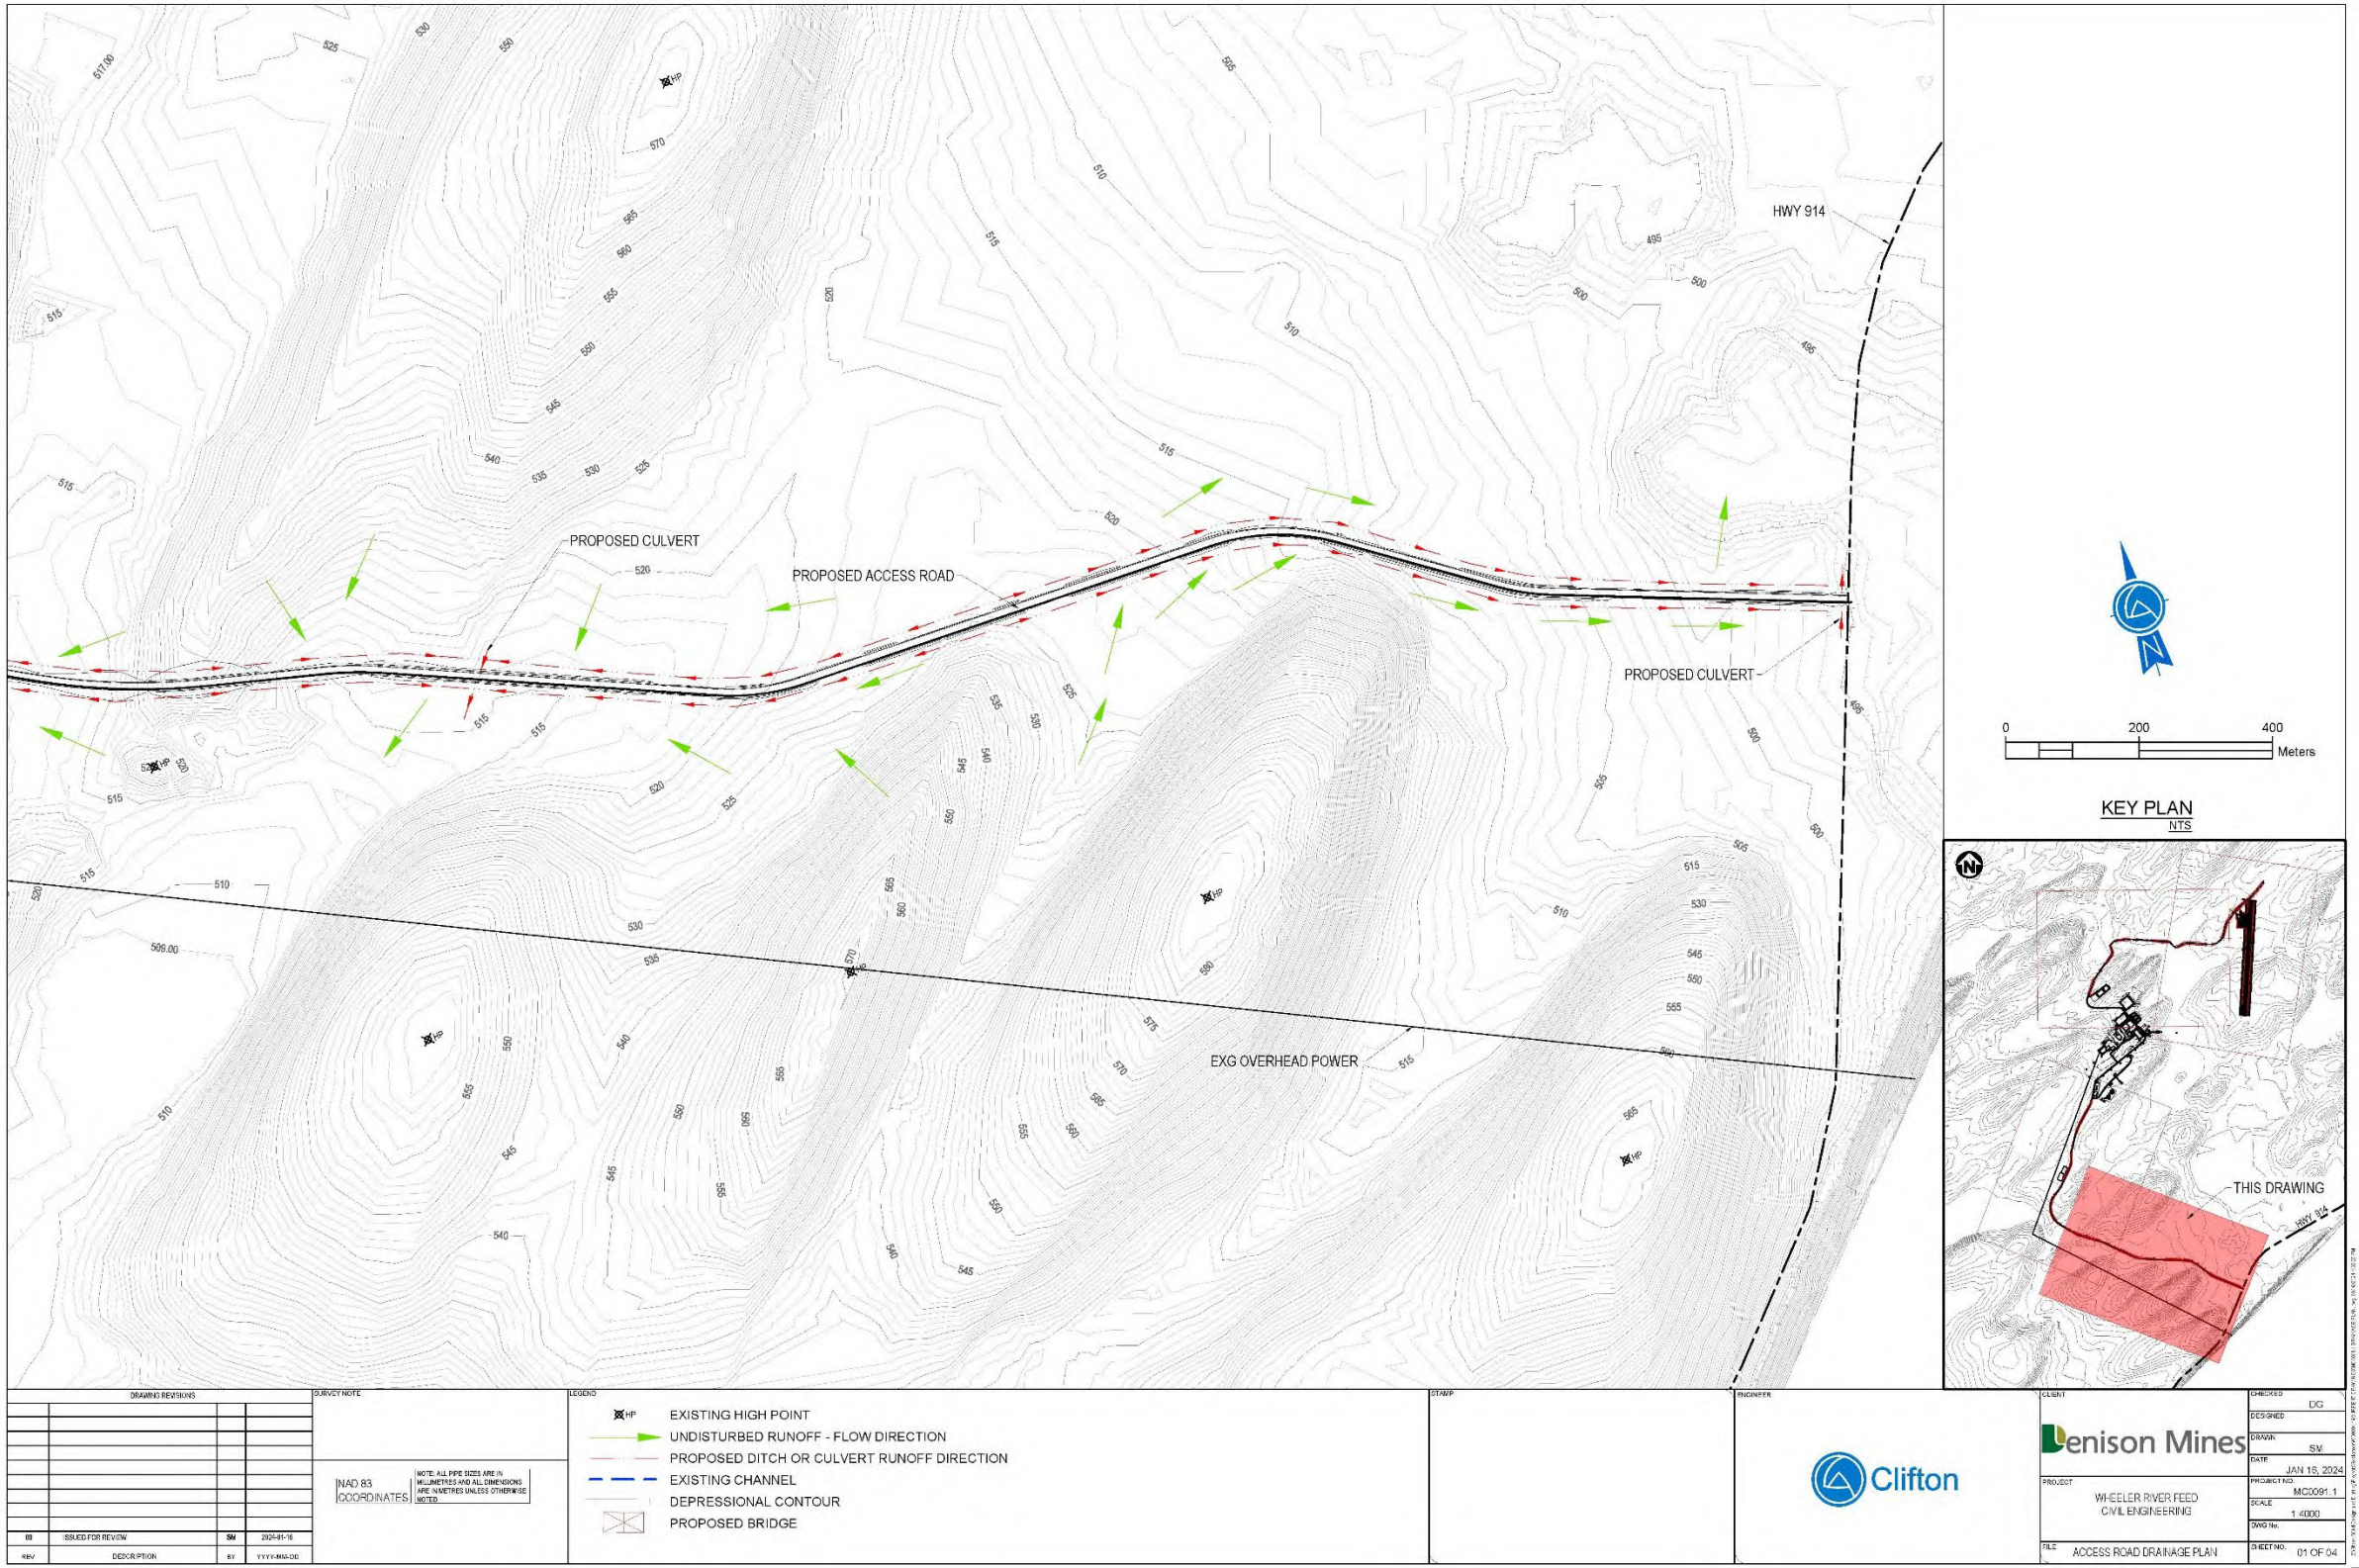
1: Conceptual Site Drainage – Access Road (segment 1 of 2)
